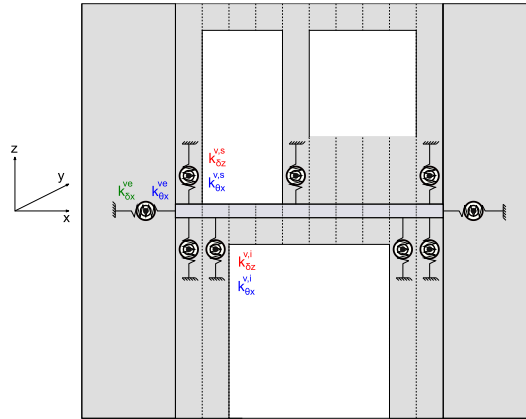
Pair of springs modelling the walls and thermal break system effect.
